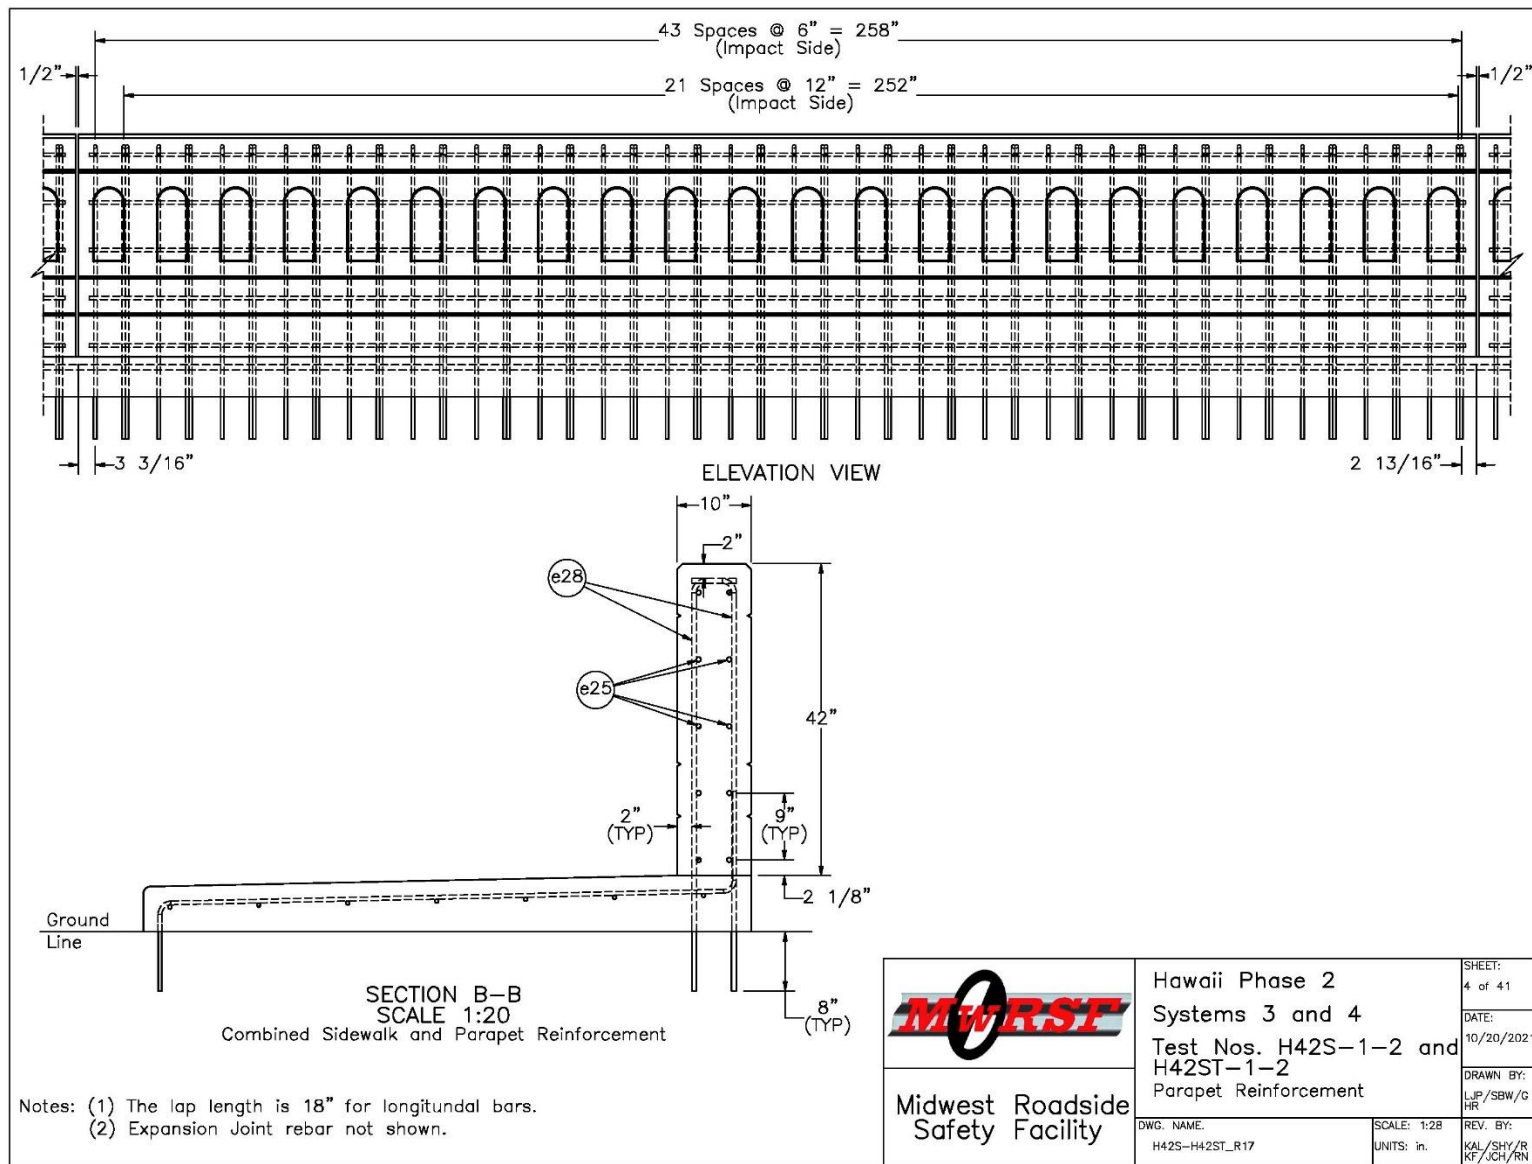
Parapet Reinforcement, Tests Nos. H42S-1 and H42S-2
